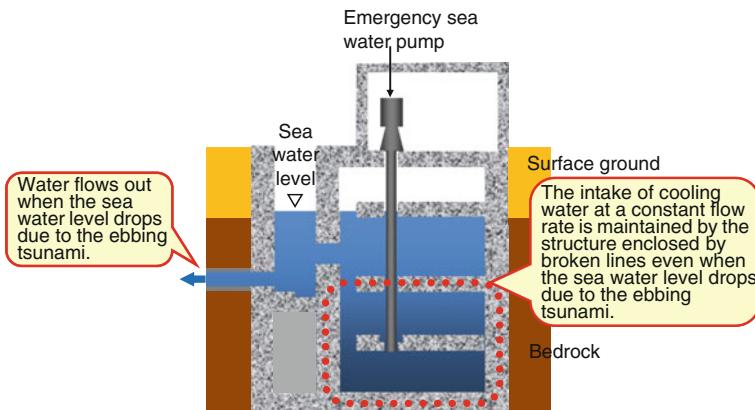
Maintaining the water intake capability of sea water pumps [2]
